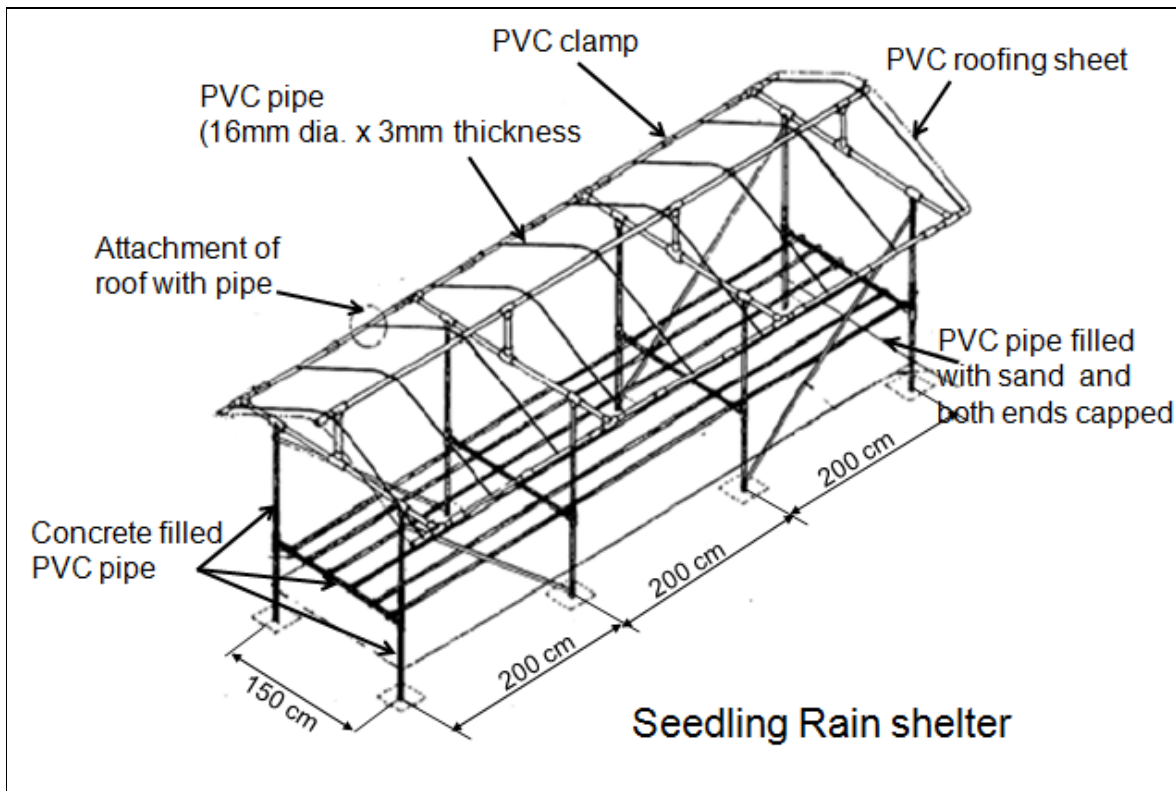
Concrete filled PVC shelter constructed in Hawaii
